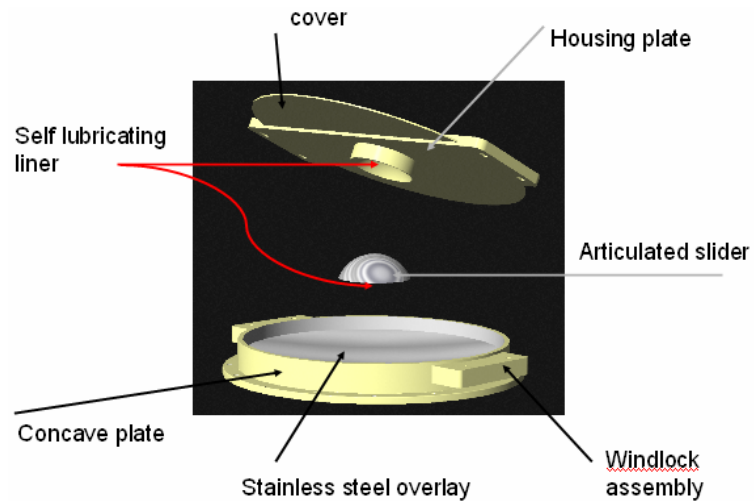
General components of a friction pendulum. Not shown in the image is a sealing system that rest between the two circular edges when the bearing is assembled, this helps in preventing dirt and debris from getting into the sliding zone
